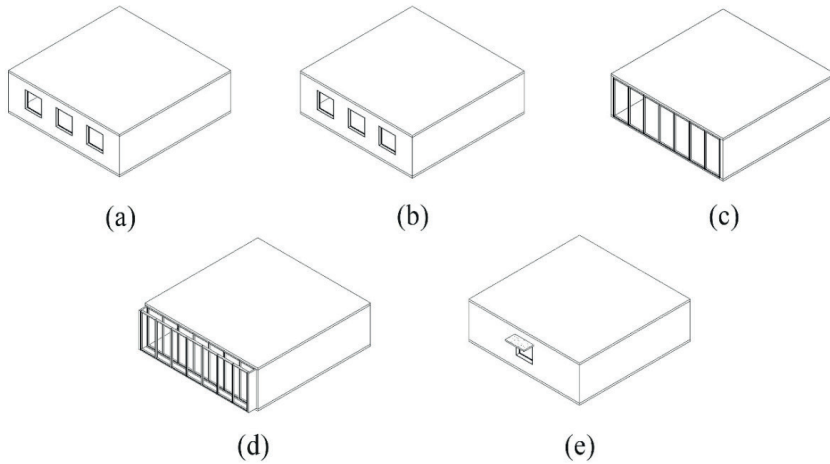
Architectural models of the analysed facade scenarios: (a) S1 – base masonry wall, (b) S2 – externally insulated masonry wall (ETICS), (c) S3 – curtain wall facade, (d) S4 – double-skin facade with ventilated cavity, and (e) S5 – enhanced ETICS with reduced glazing ratio and external shading devices.
